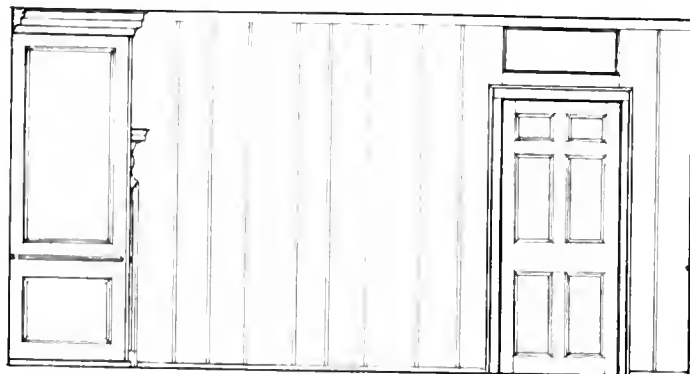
12c Living Room North Elevation. The small area to the left is part of the paneled fireplace wall. The rest of the north wall is random width feather board.
